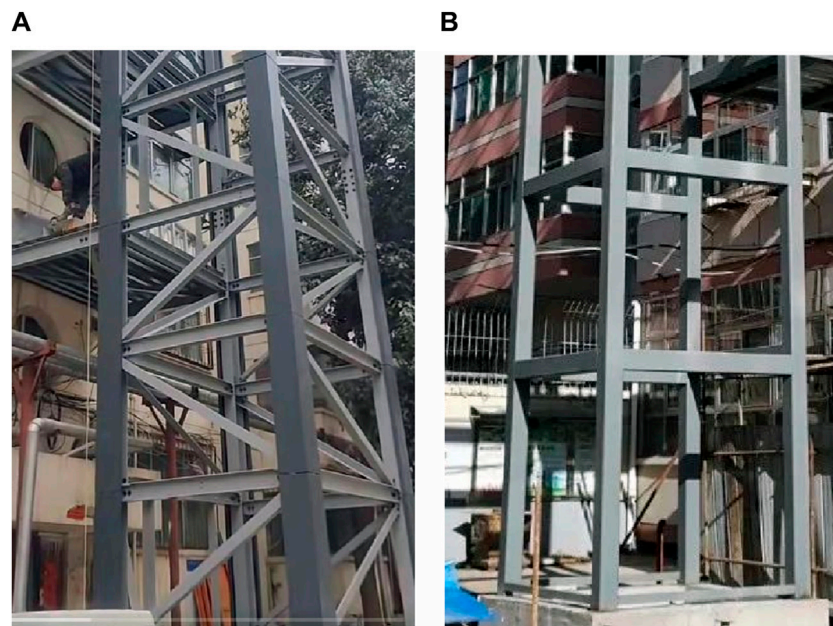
Examples of steel structure elevators which outside existing buildings. (A) Angle steel truss structure and (B) steel tube frame structure.
